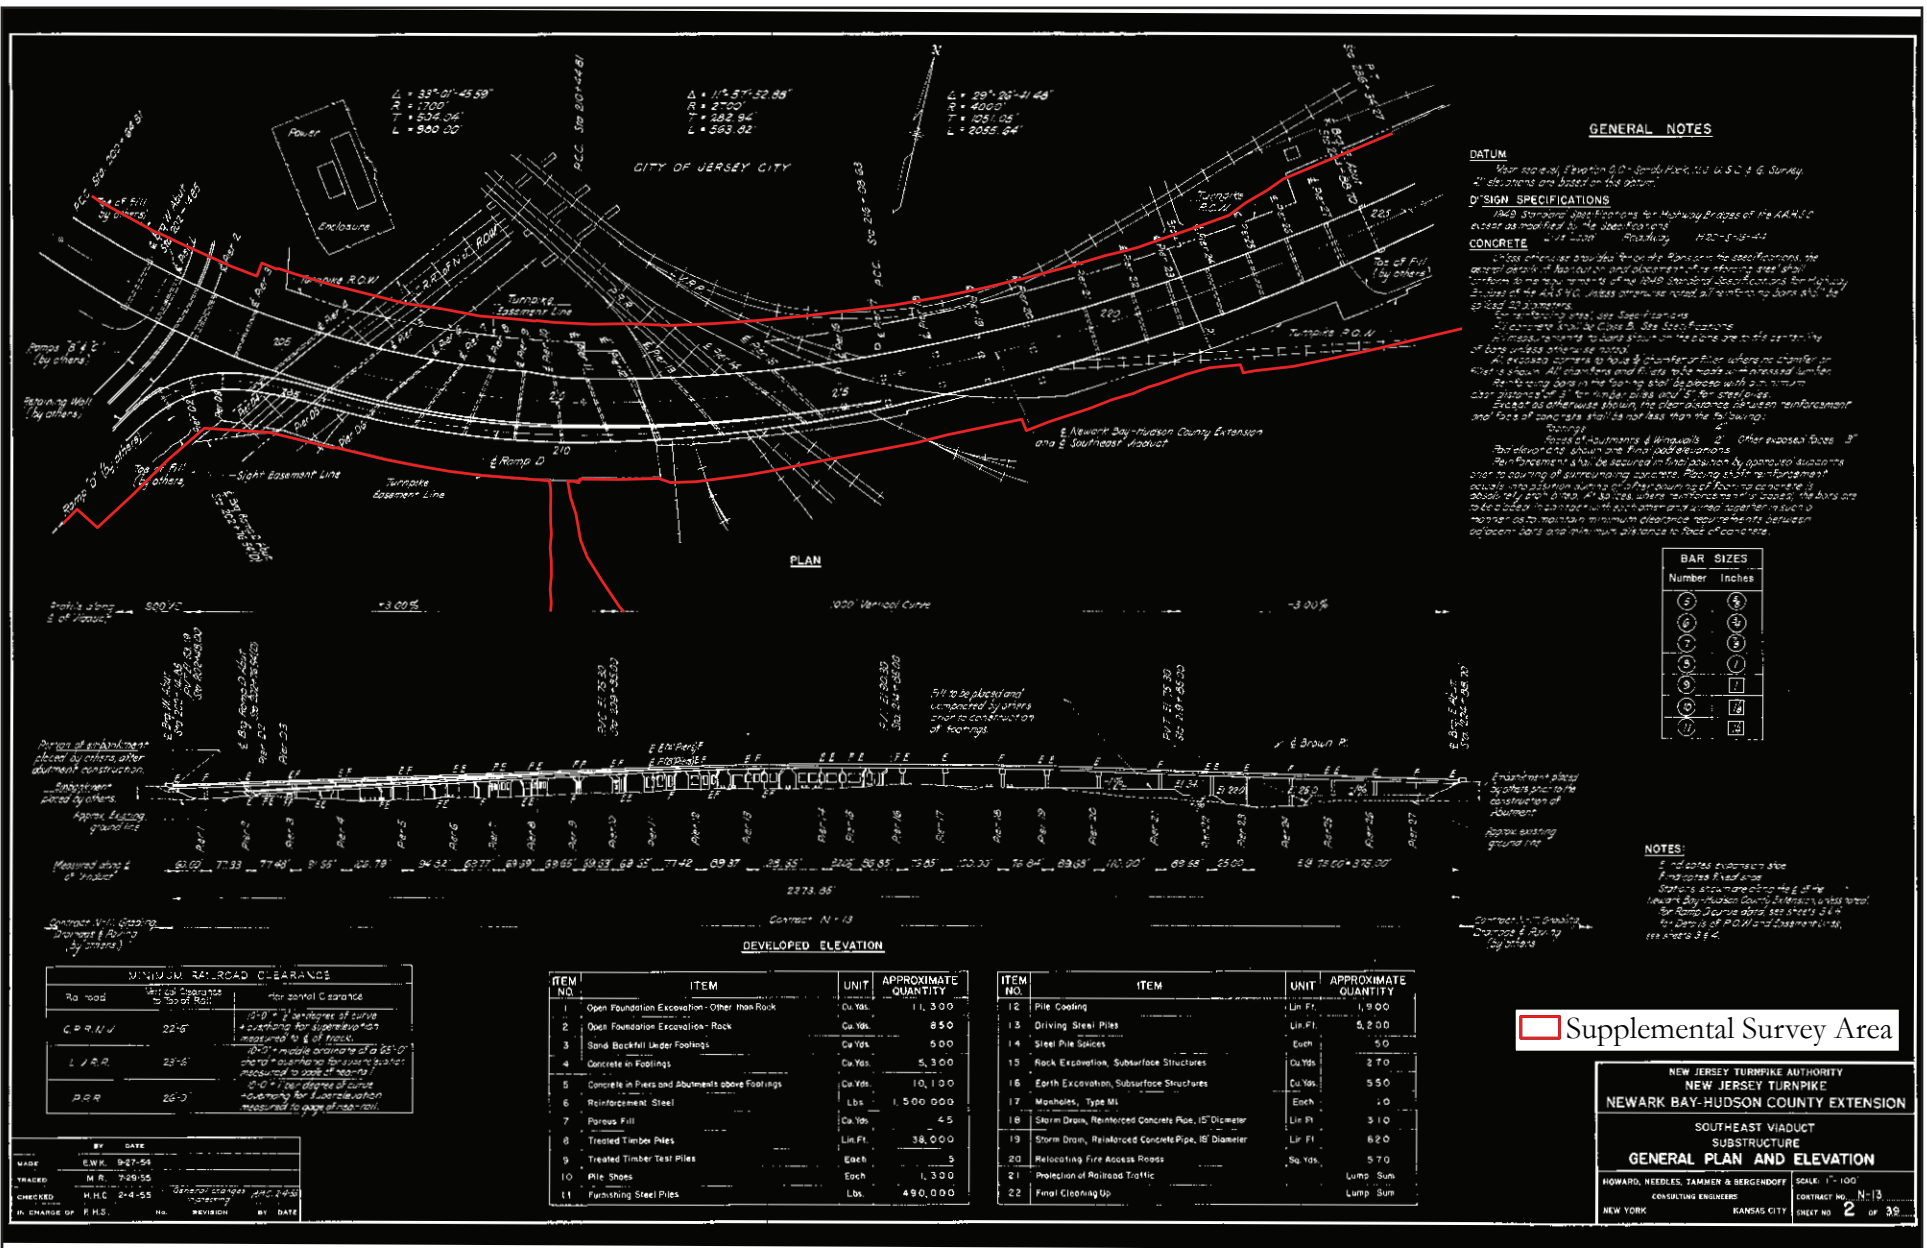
Southeast Viaduct Substructure, General Plan and Elevation (Howard, Needles, Tammen and Bergendoff 1954a).
